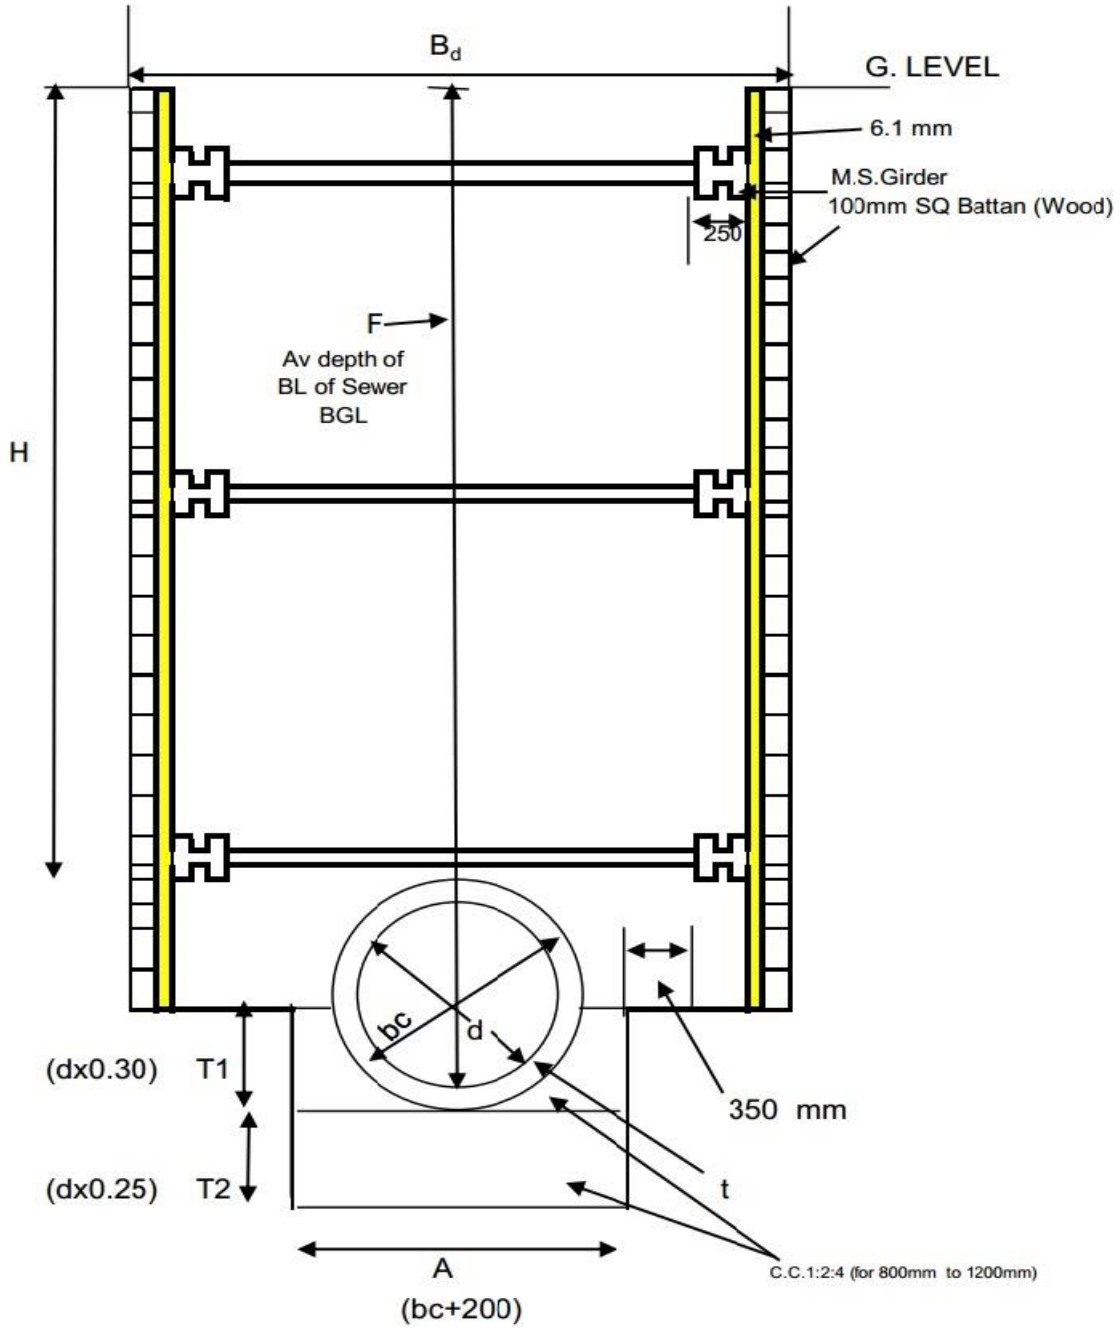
Typical Cross Section for Laying R.C.C. Pipe with Confined Cut Excavation
